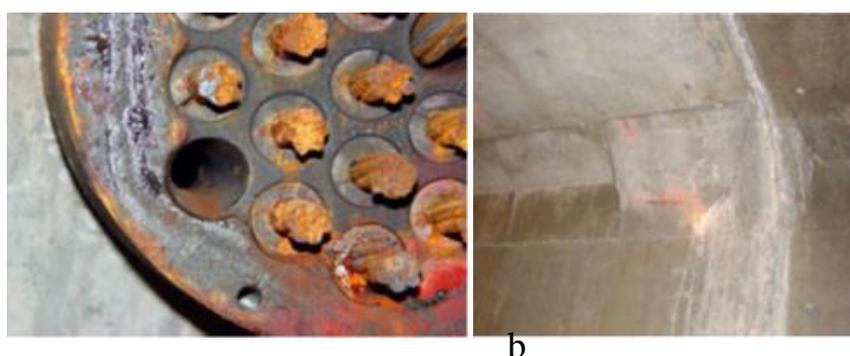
San Francisco – Oakland Bay Bridge (ID-14): a) close-up view of an anchorage head showing signs of corrosion from water collected at the anchorage; b) view of a crack at an anchor block showing efflorescence (Reis, 2007).
